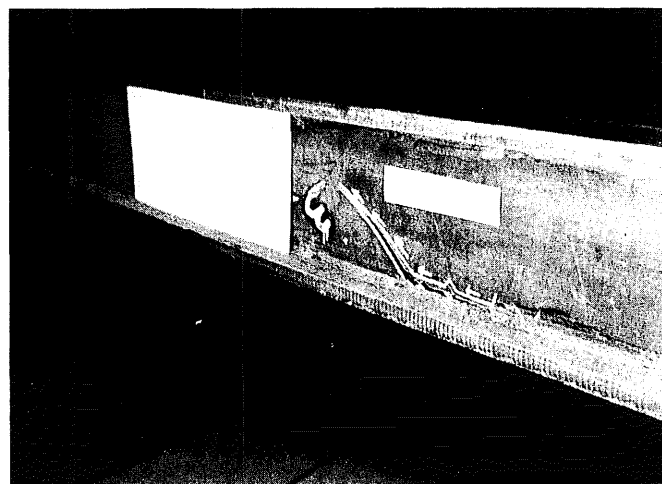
TYPICAL FATIGUE FRACTURES OF SPECIMENS WITHOUT SPLICES
